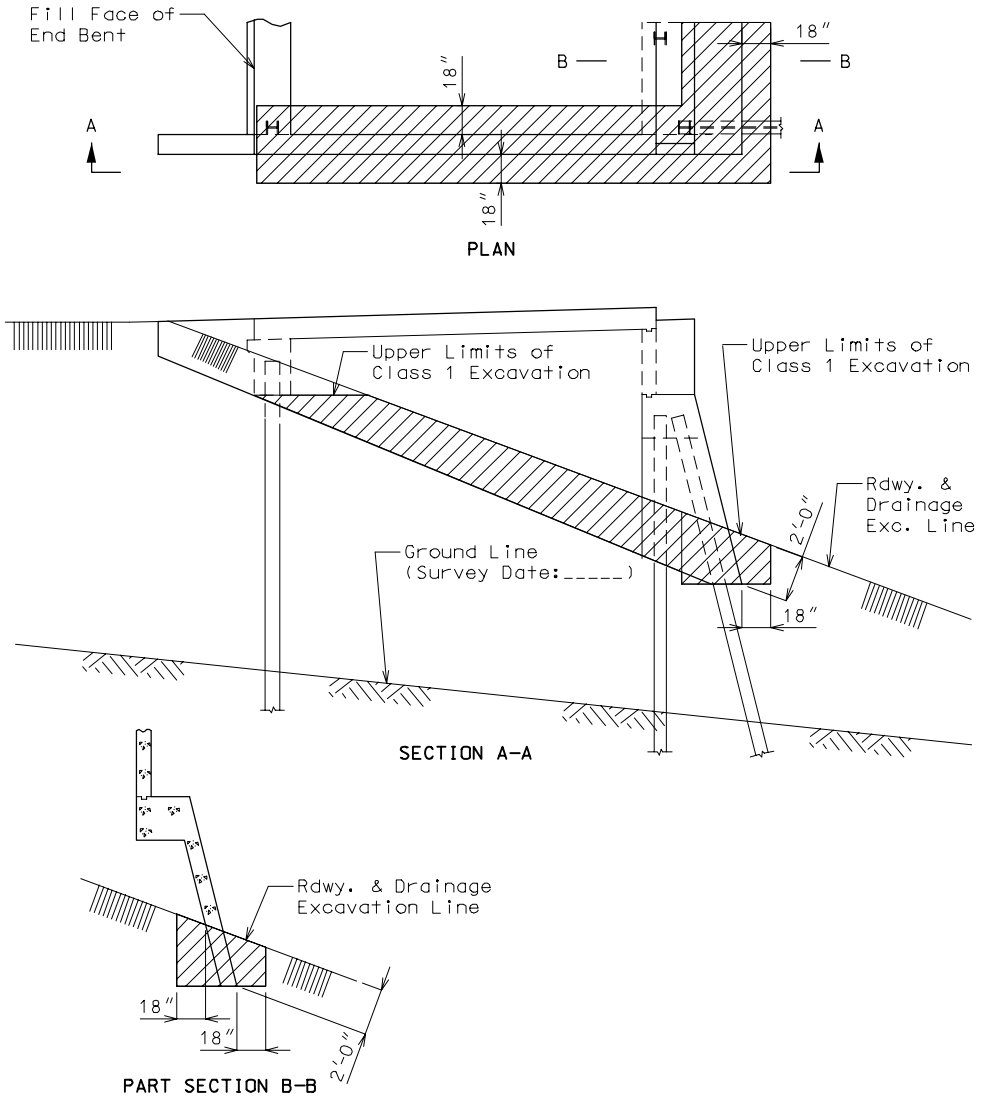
Semi-Deep Abutment Excavation Limits (Case 2 *)
